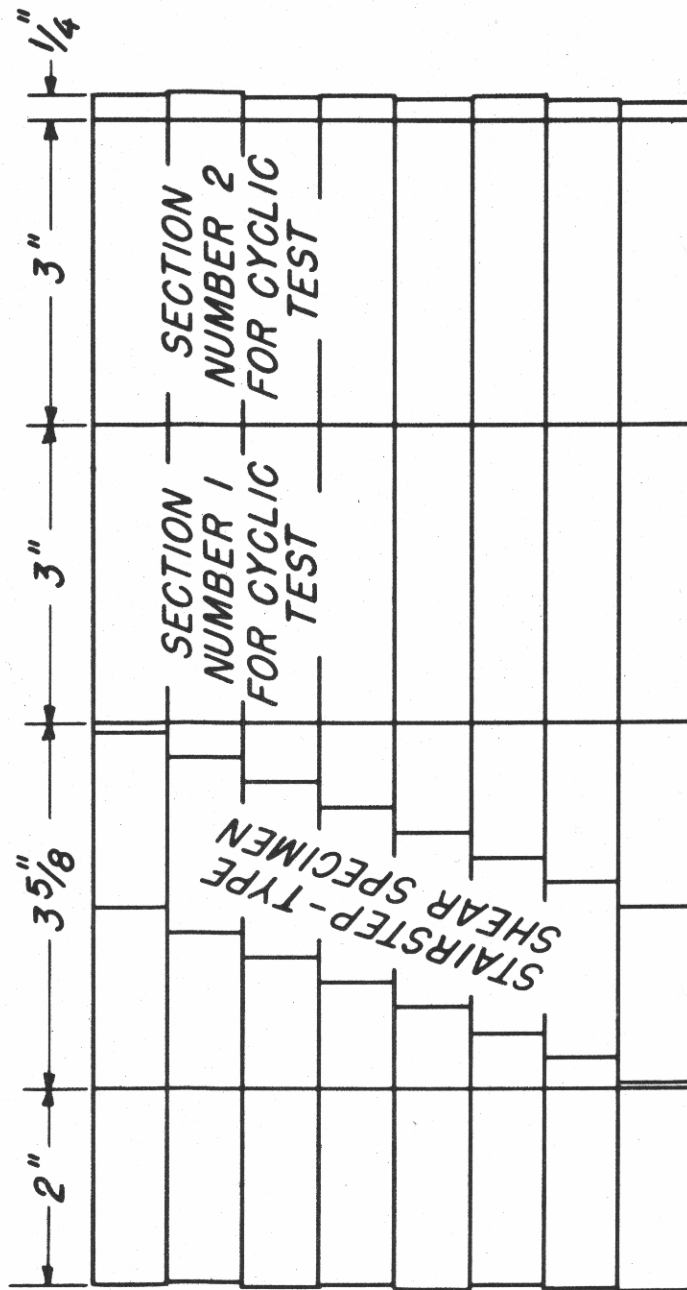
Side view of laminated beam, showing method of cutting test specimens.
